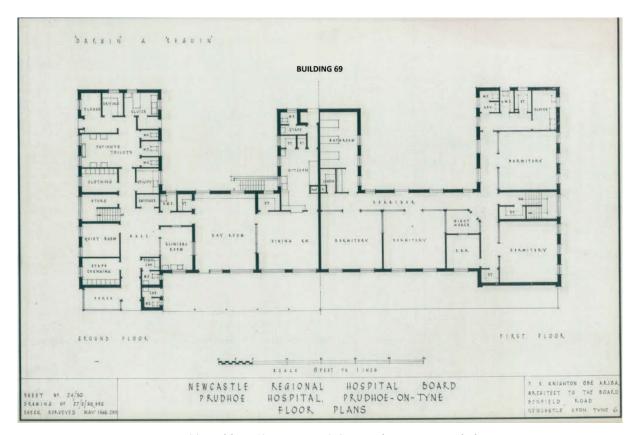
Building 69, Darwing & Seguin, historic ground plan.
